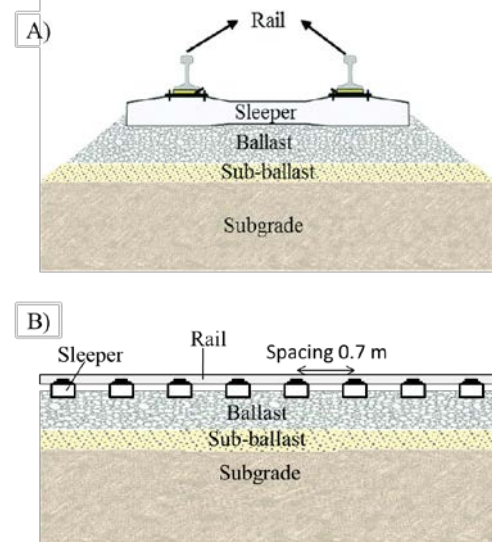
Typical railway track structures, A) cross-section and B) longitudinal section, (Modified from [2])
